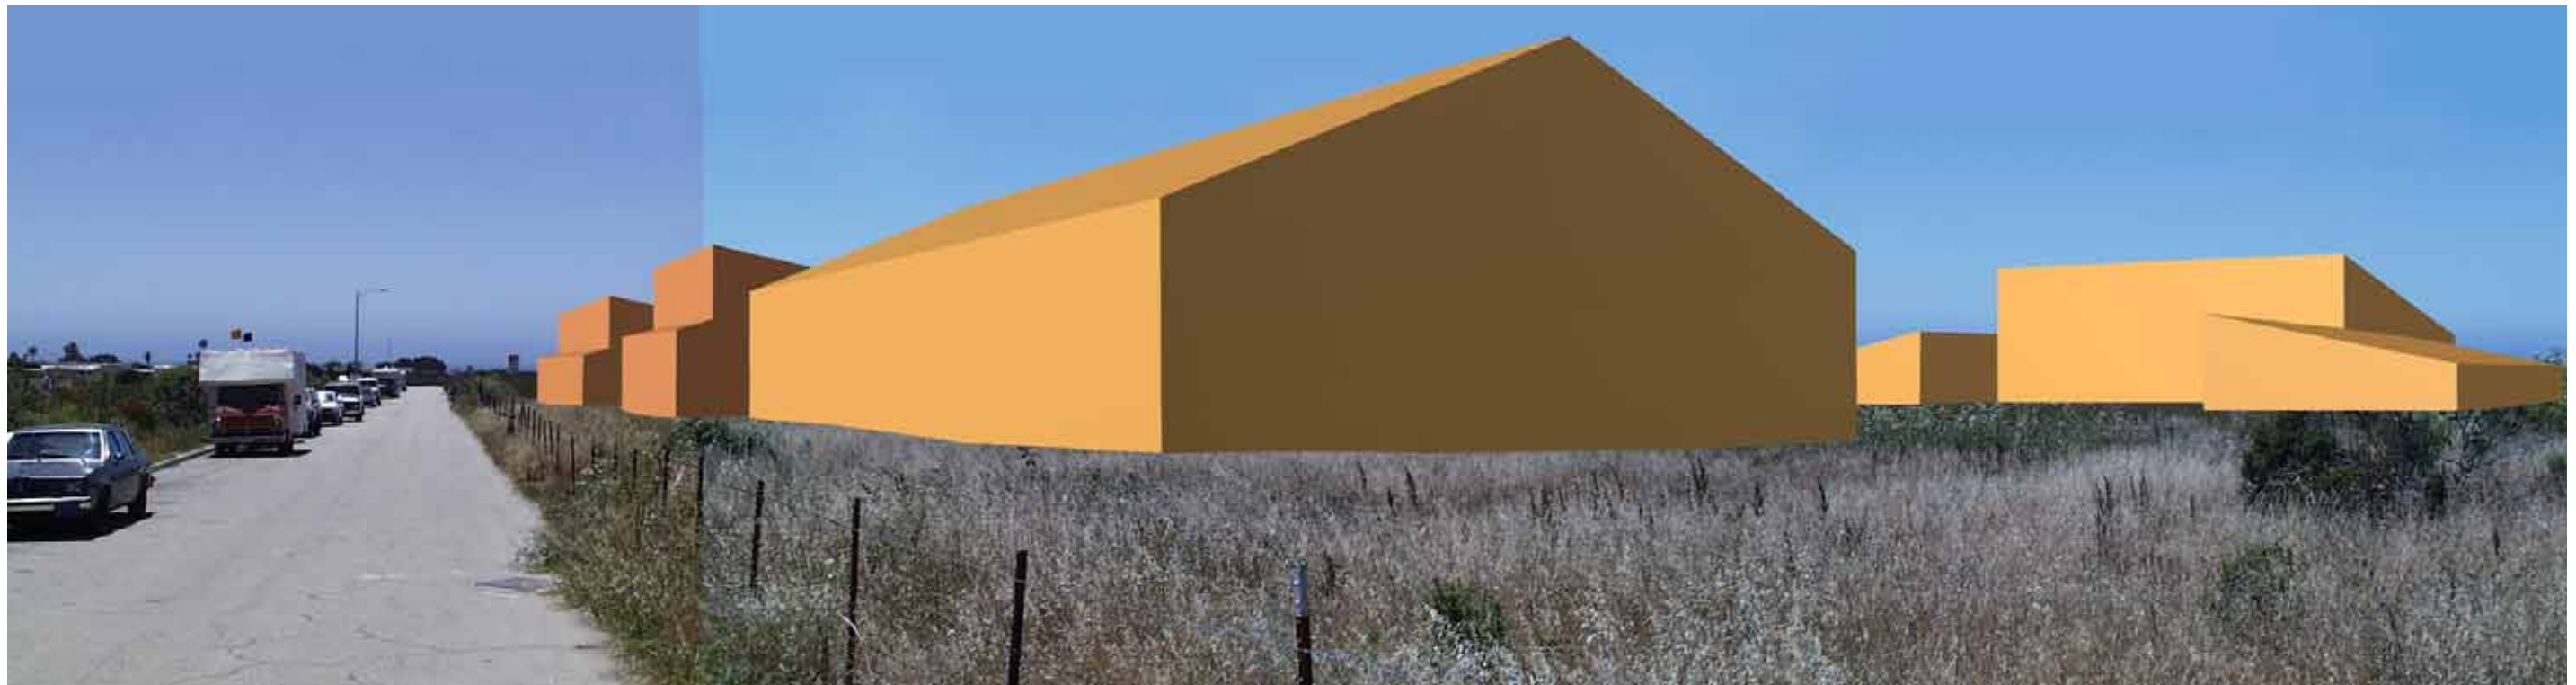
Proposed view of site from northwest corner of Shaffer Road (not on UCSC property), near train tracks, looking southwest.
